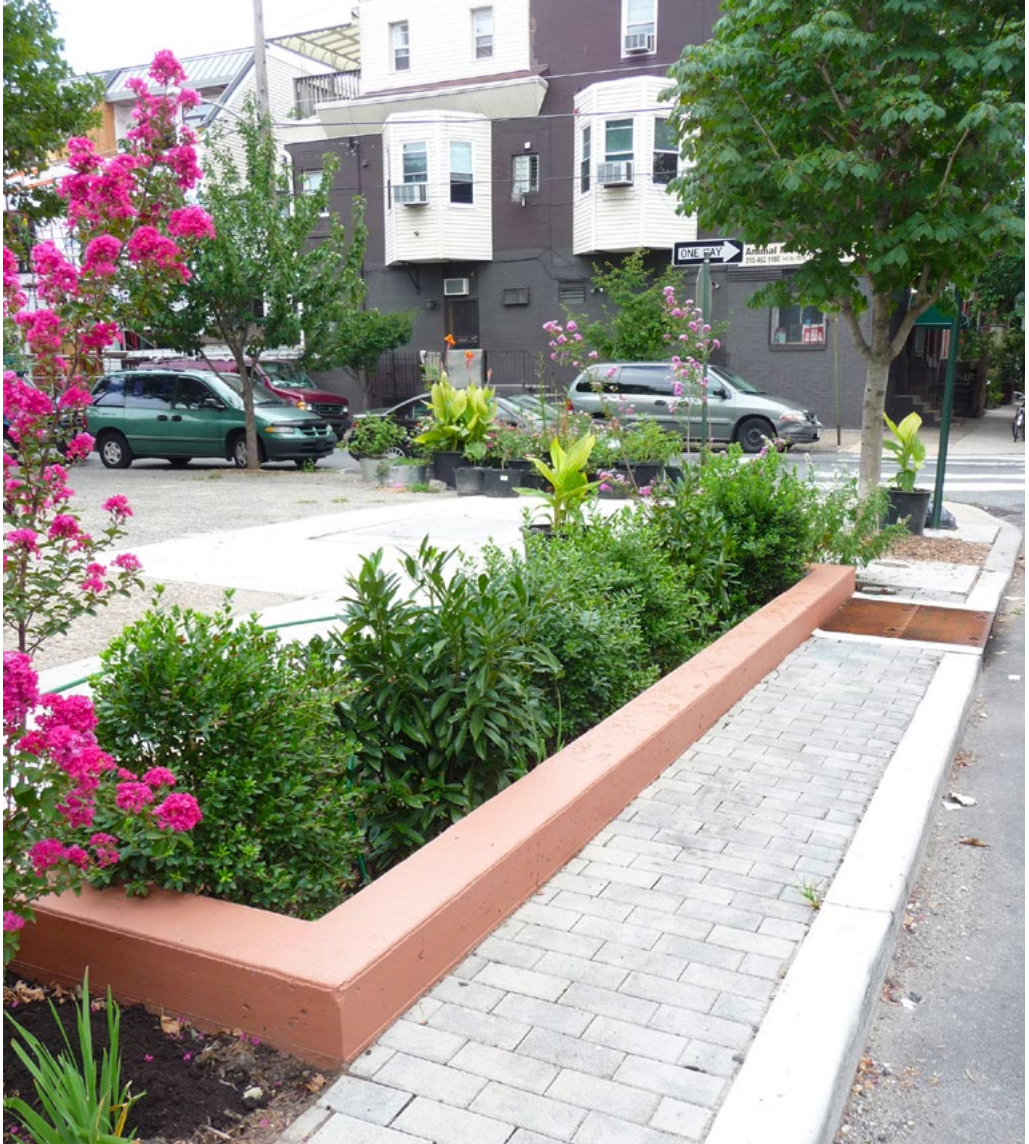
Rain garden corner bump out installed by Philadelphia Water.
